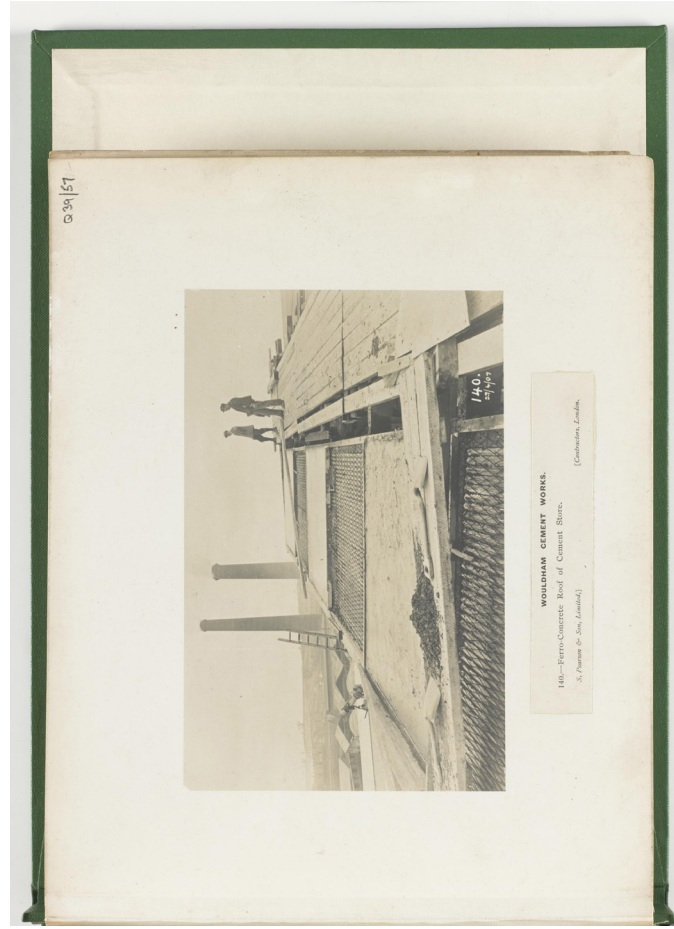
Unknown author, “Ferro-concrete roof of cement store” 1907
